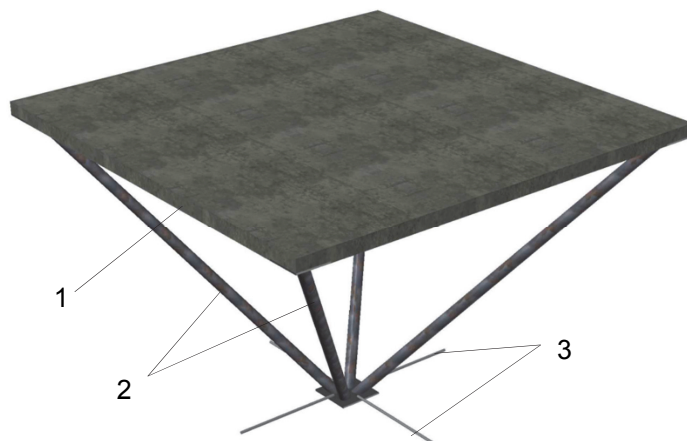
Separate element of steel-reinforced concrete structural-guy rope cladding
